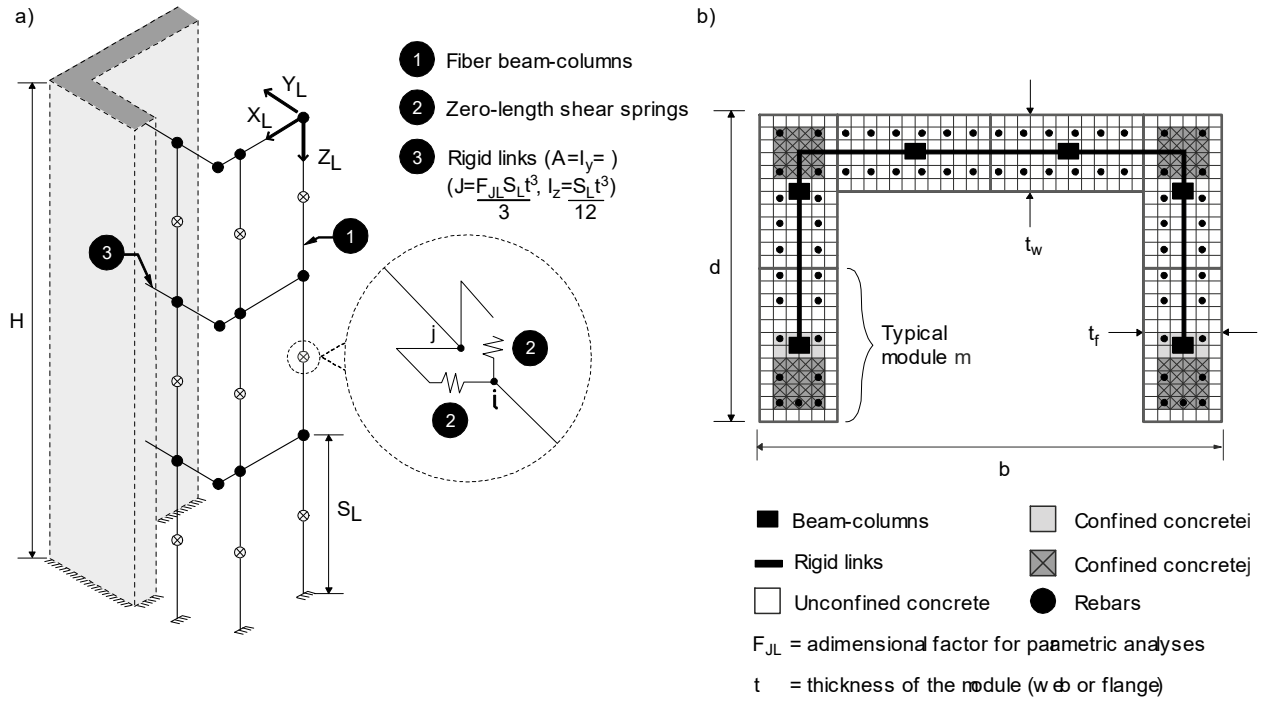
WCM model with modules: (a) 3D view and (b) cross-sectional view ($m=6$)
